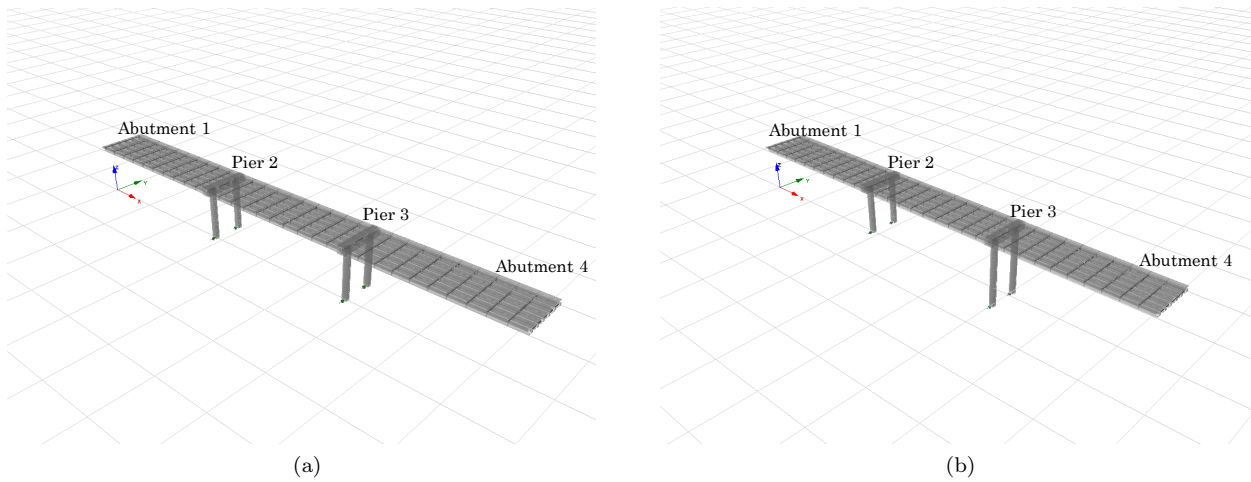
Figure shows the two different bridge models used for this study (a) Bridge 1 and (b) Bridge 2.
